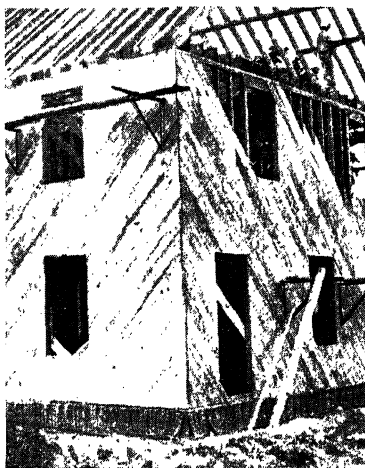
B.—The better method. Diagonal sheathing stiffens the frame. (Courtesy of Alexander Houses, Inc.)
